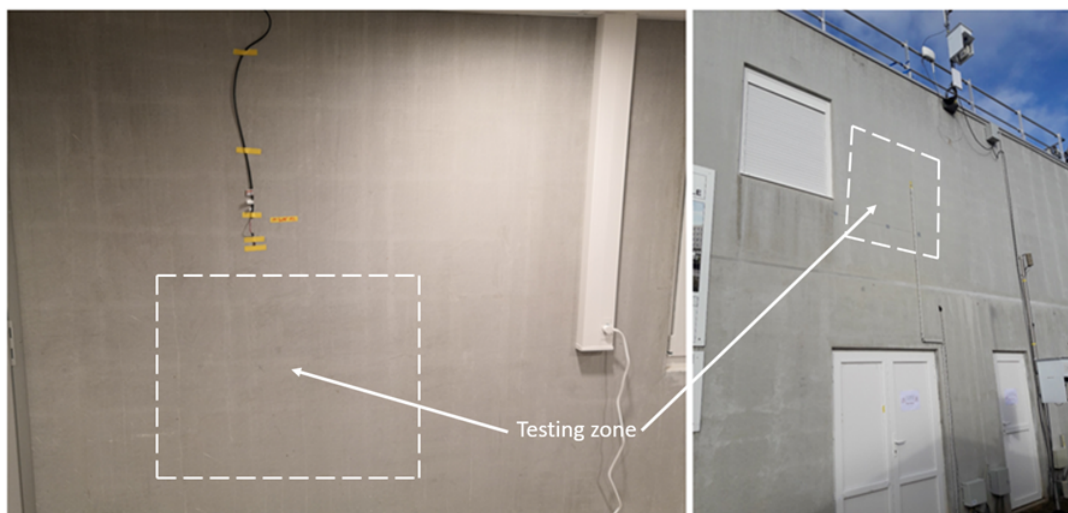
Tested SW wall: (left) Interior and (right) exterior views of the wall.
